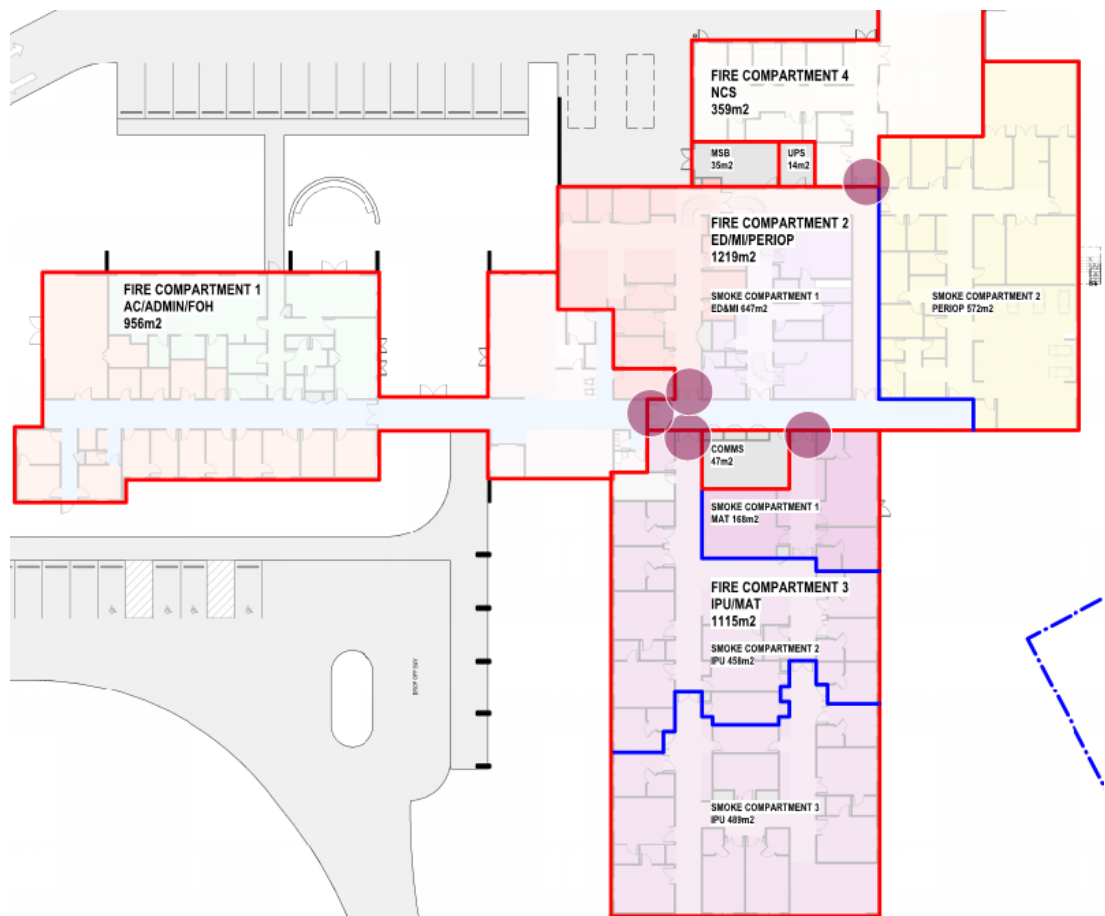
Horizontal exit doors that do not swing in the direction of egress.
